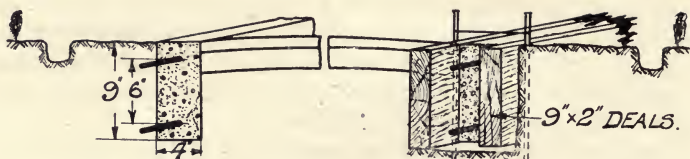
Method of constructing submerged concrete kerb in Surrey.
